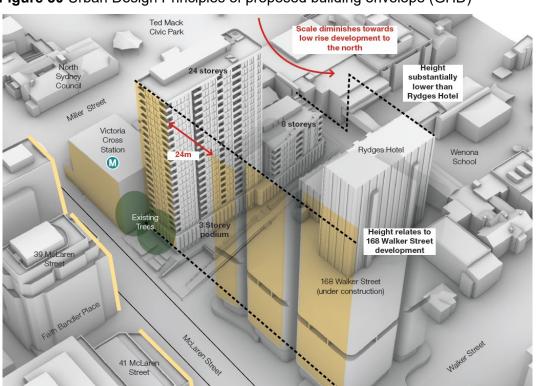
Urban Design Principles of proposed building envelope (GHD)
